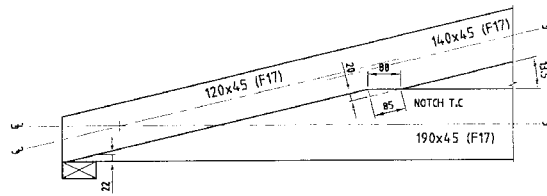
SKETCH OF FAILED DOUBLE GIRDER TRUSS (Scarf Cut)
